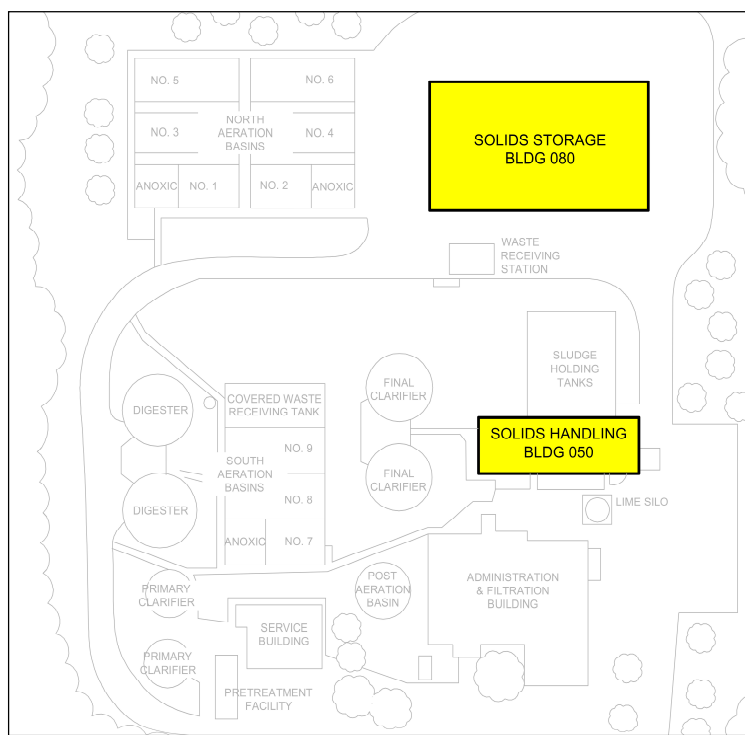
On-site Solids Handling Building and Solids Storage Building Locations
